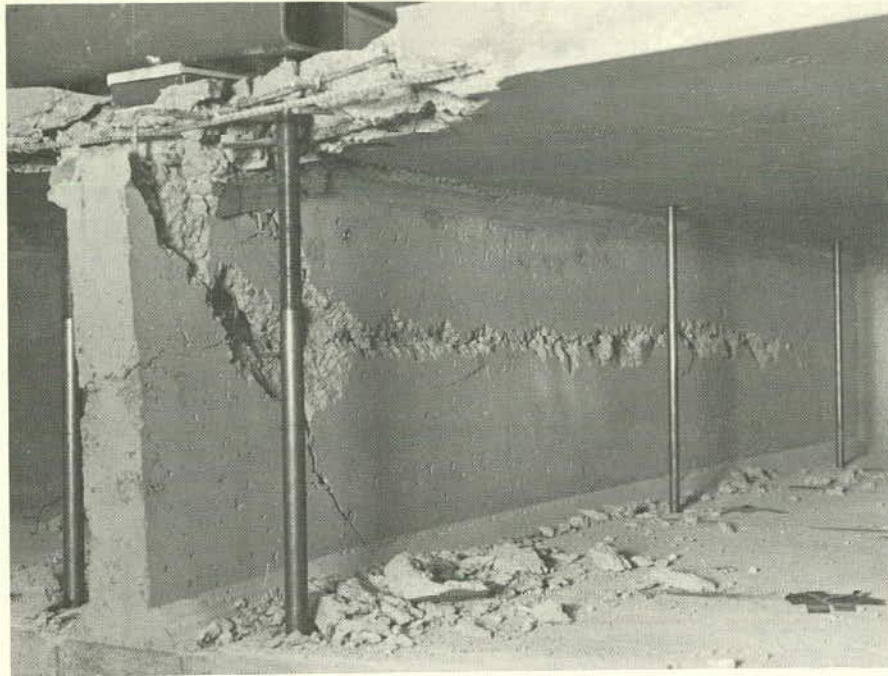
Detail of Horizontal Shear Distress of Girder Web No. 4 Specimen SC-3
